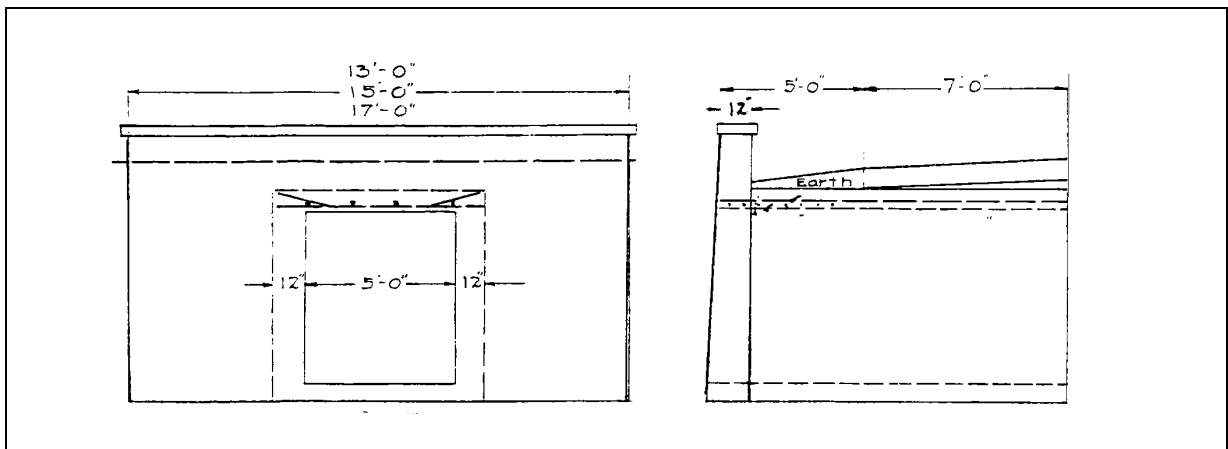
"Steel-concrete" box culvert, 1912 Standard Plans (Source: Maryland State Roads Commission 1912).
